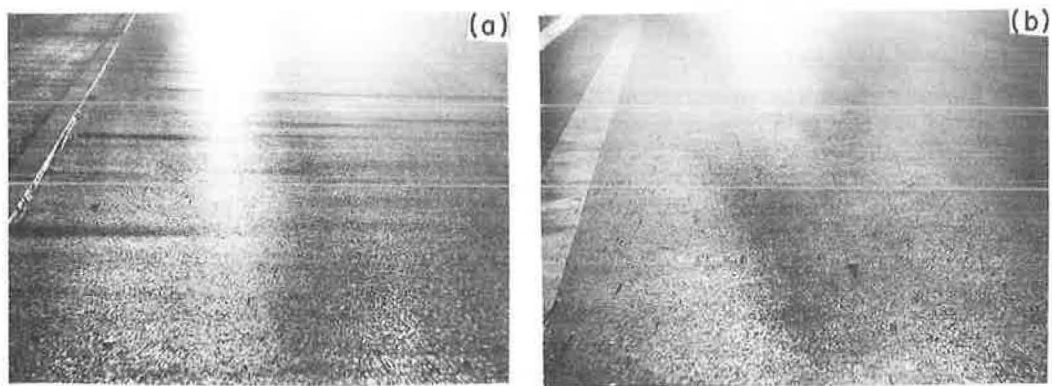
(a) Pavement laid with fixed screed paver; (b) pavement laid with floating screed paver.
